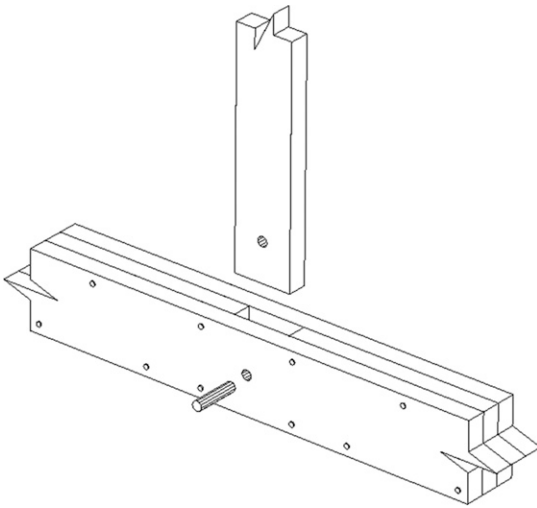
Built-up nail-glued mortise and tenon joint construction.
